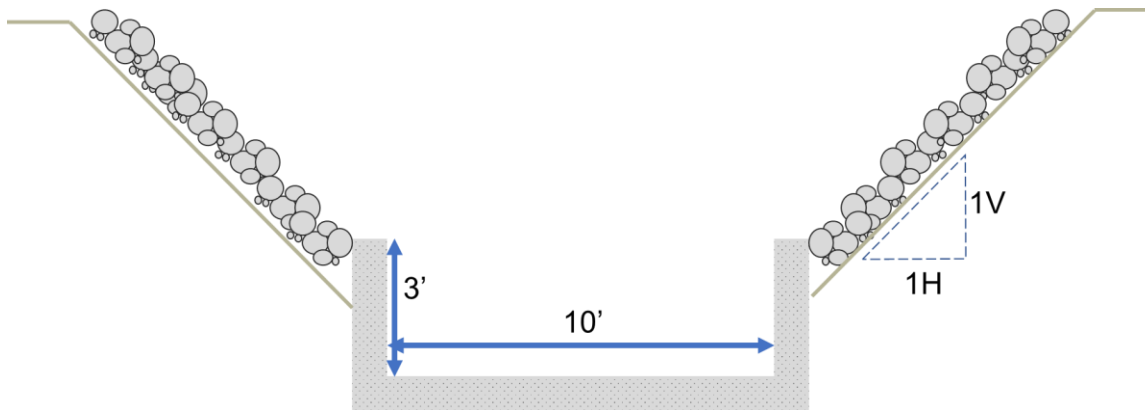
Cross-section utilized in modeling the concrete channel alternative. This is based on the typical cross-section proposed by the City of Lawler featuring a concrete bottom section, with riprap placed on banks.
